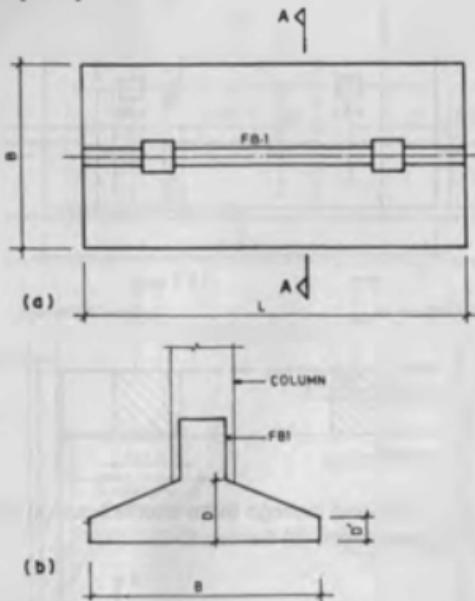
A. Combined footings three alternatives. (a) Plan of combined footing with one longitudinal footing beam FB1; (b) Section A-A.
